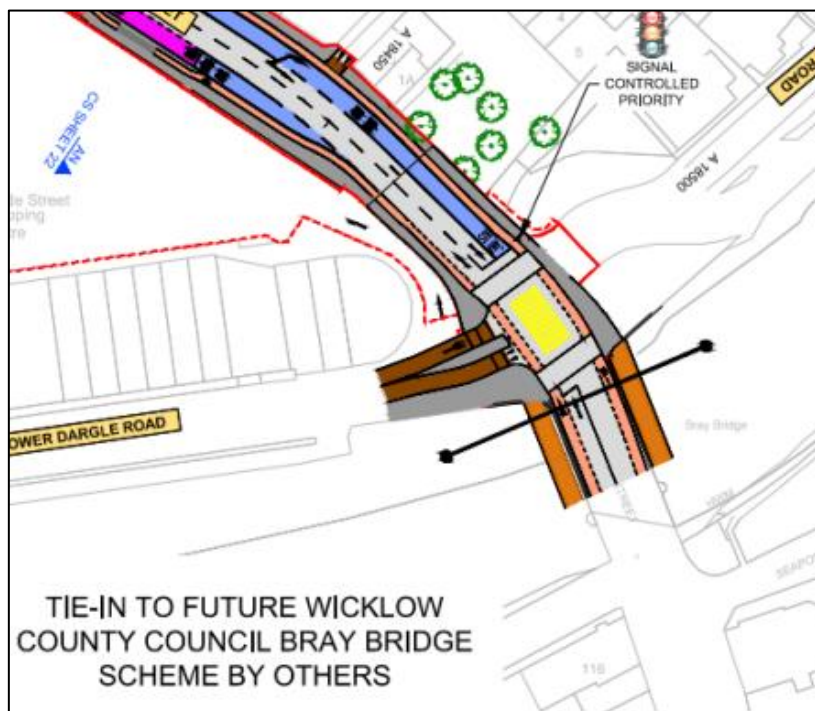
Extract from General Arrangement Drawings showing the Proposed Scheme design is co-ordinated with the Proposed WCC Bray Bridge Improvement Scheme (Sheet 52)
